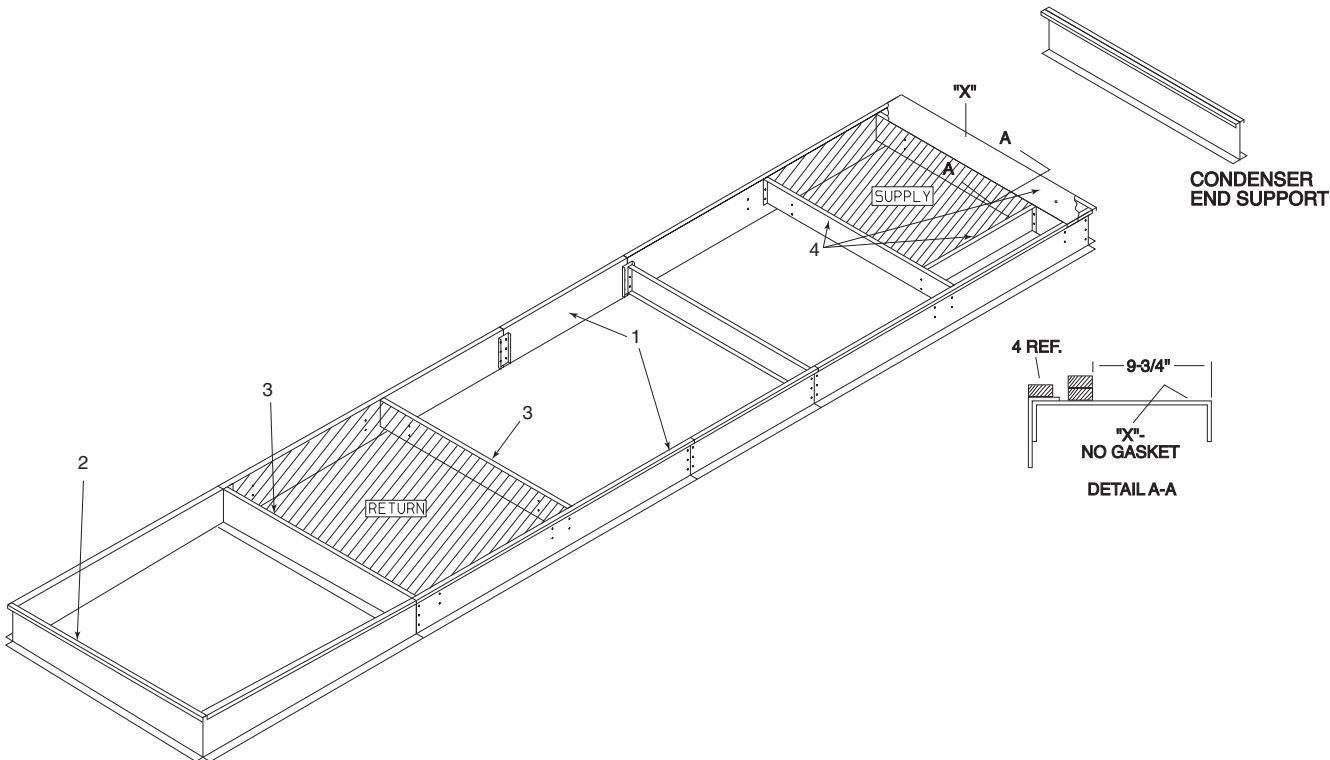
Condenser Section Roof Curb (Sizes 090 and 100)
